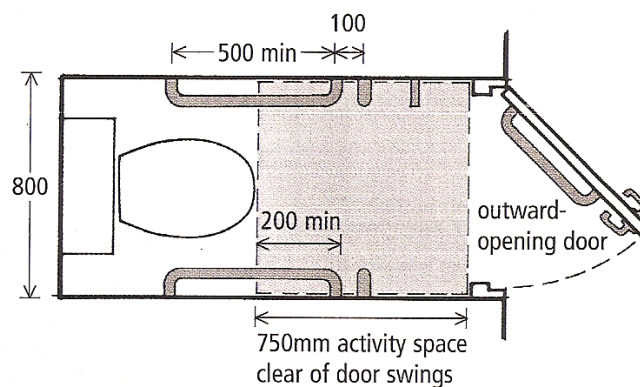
Floor plan for ambulant disabled cubicle. CAE, 2004:23
